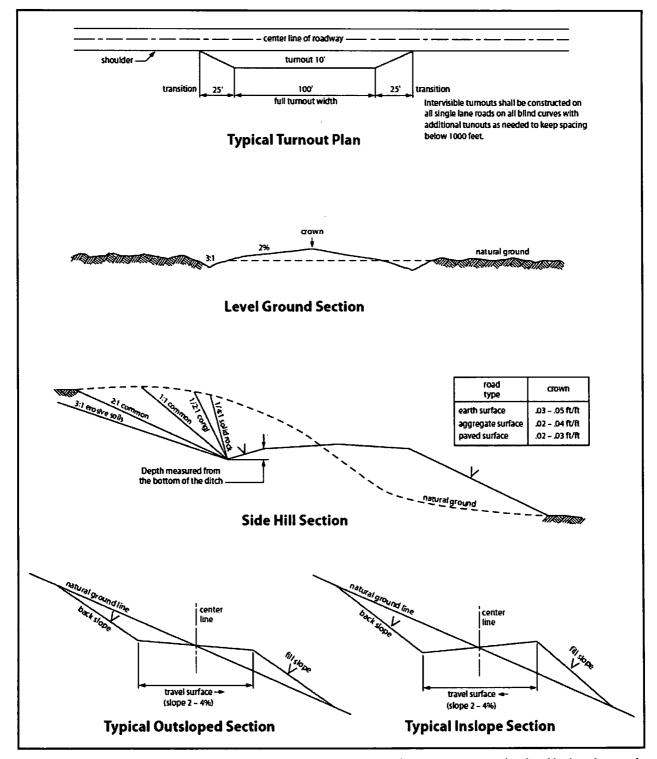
Cross-sections and plans for typical road sections representative of BLM resource or FS local and higher-class roads.
